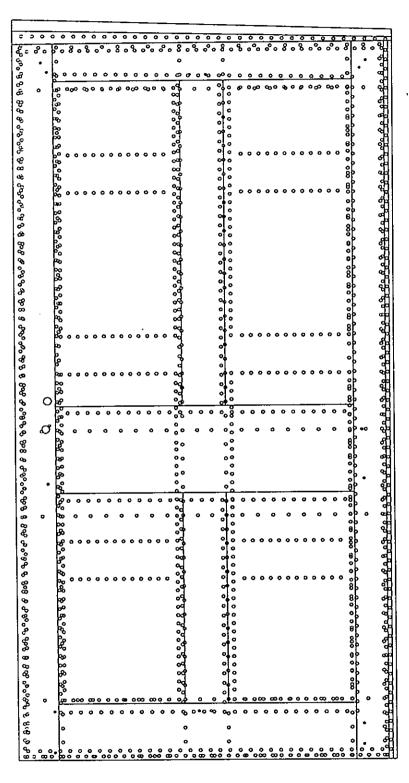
Elevation of the north side of the baize door, showing a pattern of nail holes which suggests an eight panel door design
